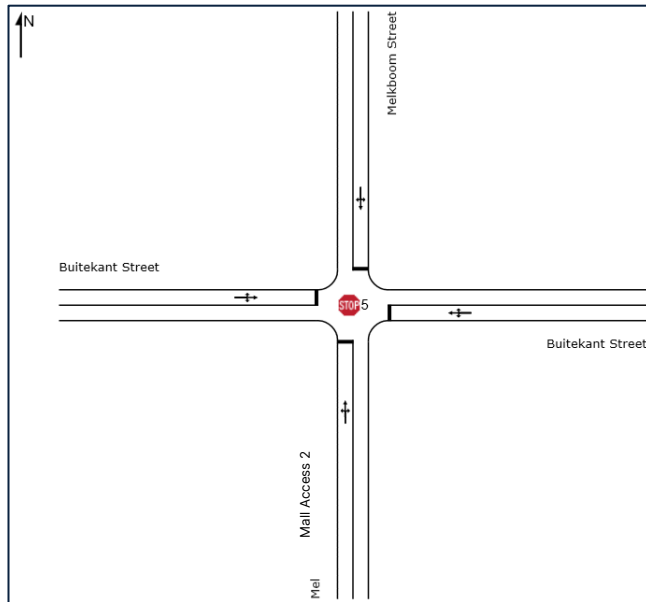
Buitekant Street and Melkboom Street: Existing Layout
